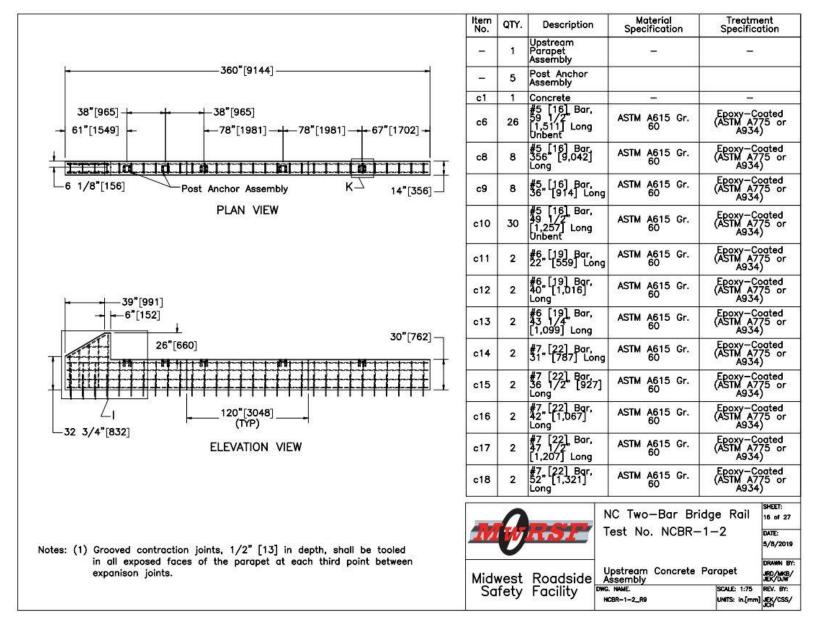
Upstream Concrete Parapet Assembly, Test Nos. NCBR-1 and NCBR-2
